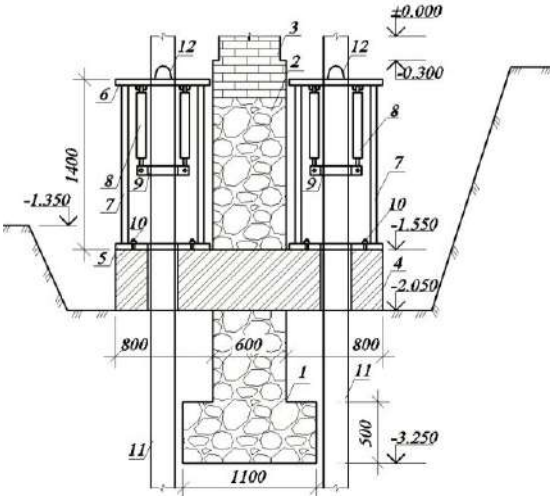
Scheme of indentation piles: 1 – existing foundation; 2 – waterproofing; 3 – brickwork; 4 – distribution beam; 5 and 6 – lower and upper support plates; 7 – risers; 8 – hydraulic cylinders; 9 – gripper for pile sections; 10 – anchor bolts; 11 – pile; 12 – loop
